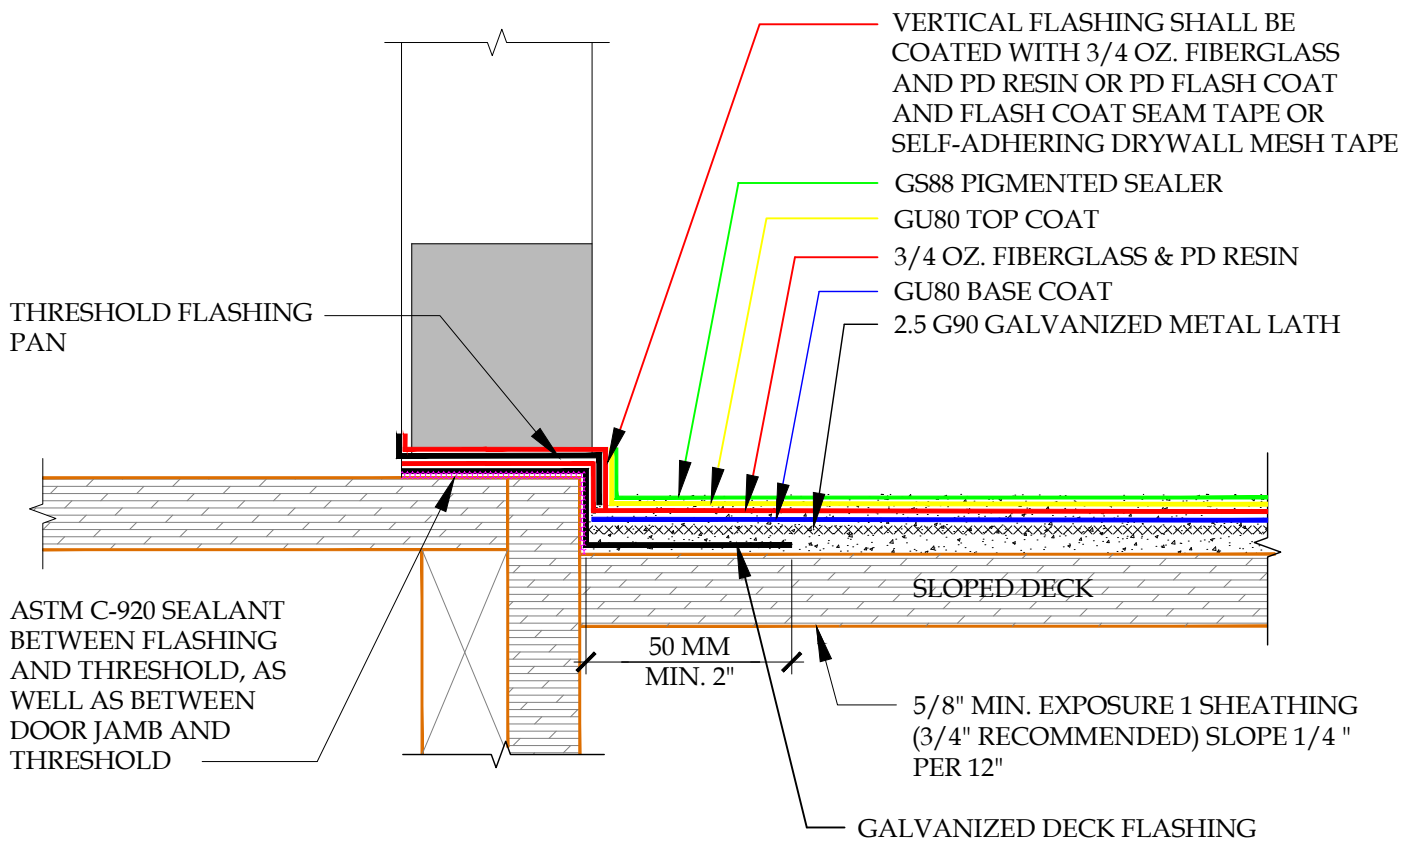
DETAIL-DOOR PAN FLASHING-ONE PIECE-ISOMETRIC-INCLEMENT WEATHER
